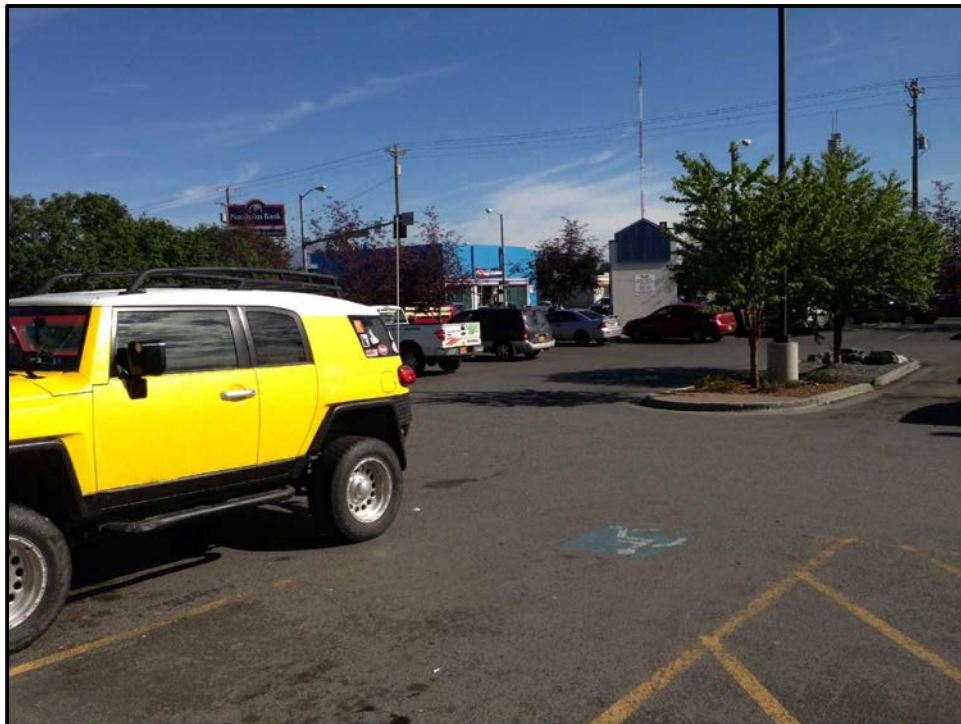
VIEW OF SITE FACING SOUTHEAST.
